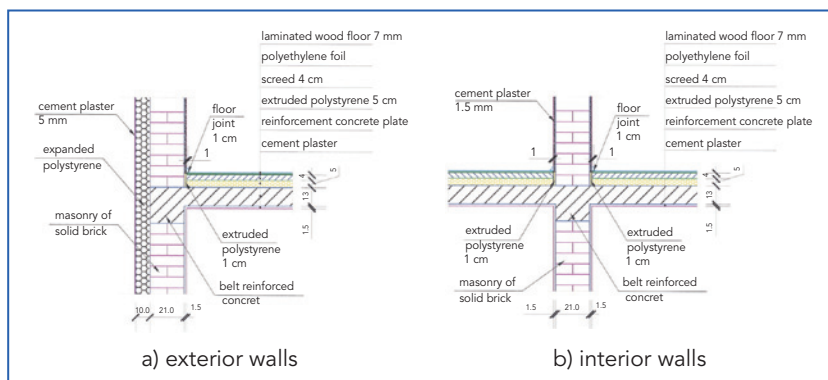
Example of the rigid contact between the structural walls and the slabs, housing (non attached).
